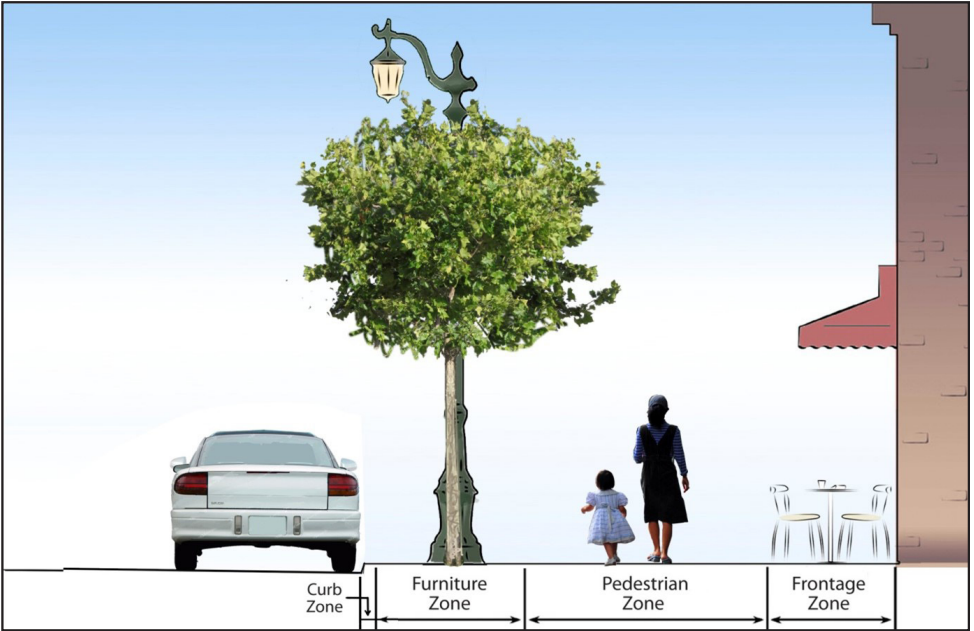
Downtown/Main Street Sidewalk Zone Design (Credit: Marty Buinsma)
